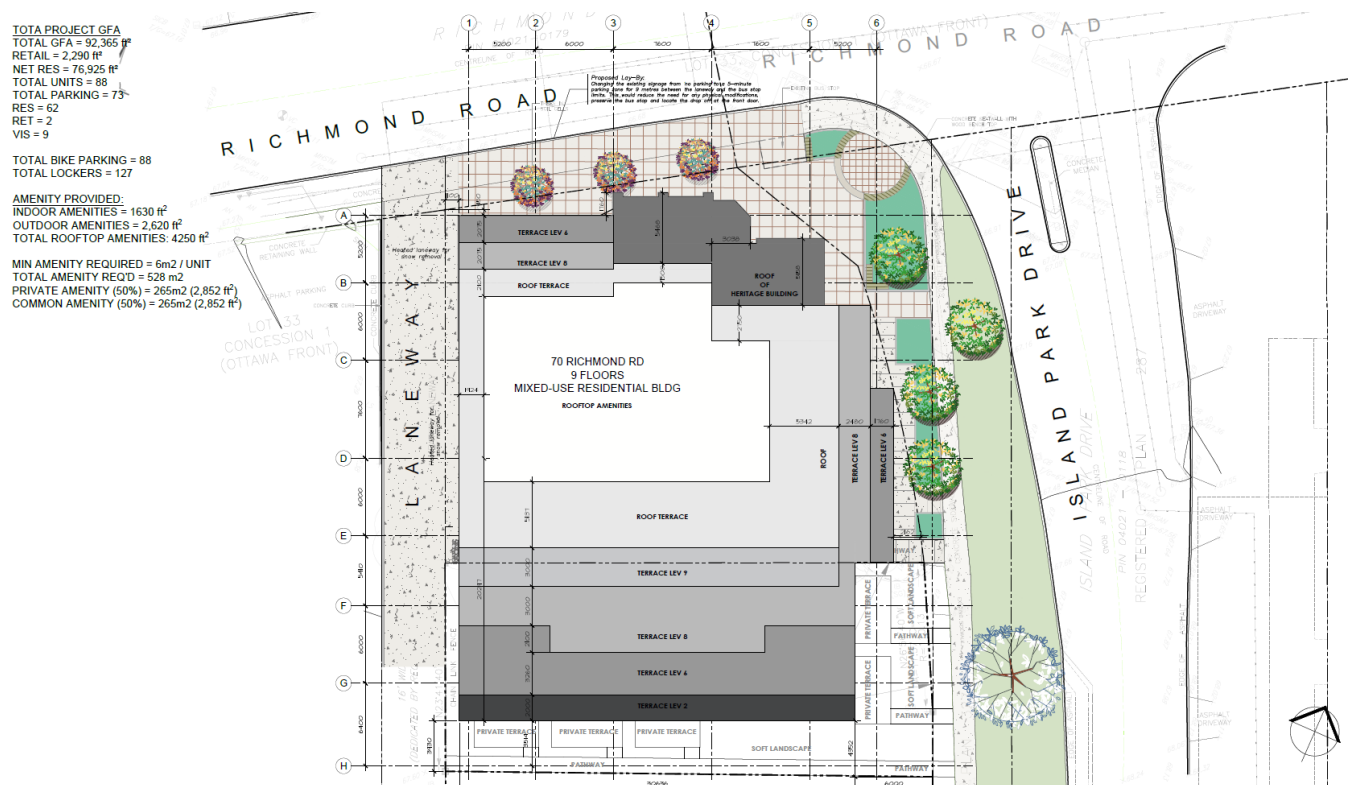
The Site Plan of the proposed development illustrates the stepbacks. The dark grey along Richmond Road indicates the portion of the Station that will sit proud of the midrise building. Source: Hobin Architecture 2022.
